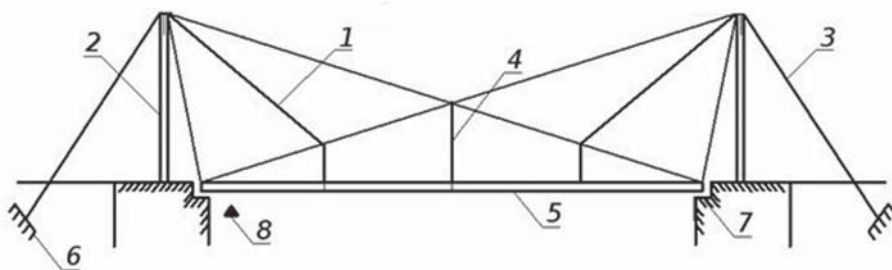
Scheme of a cable-stayed suspension bridge of the Gisklard system: 1 – cable stay; 2 – pylon; 3 – anchor cable; 4 – vertical suspender; 5 – stiffening girder; 6 – anchorage; 7 – support; 8 – the supporting part of the stiffening girder
